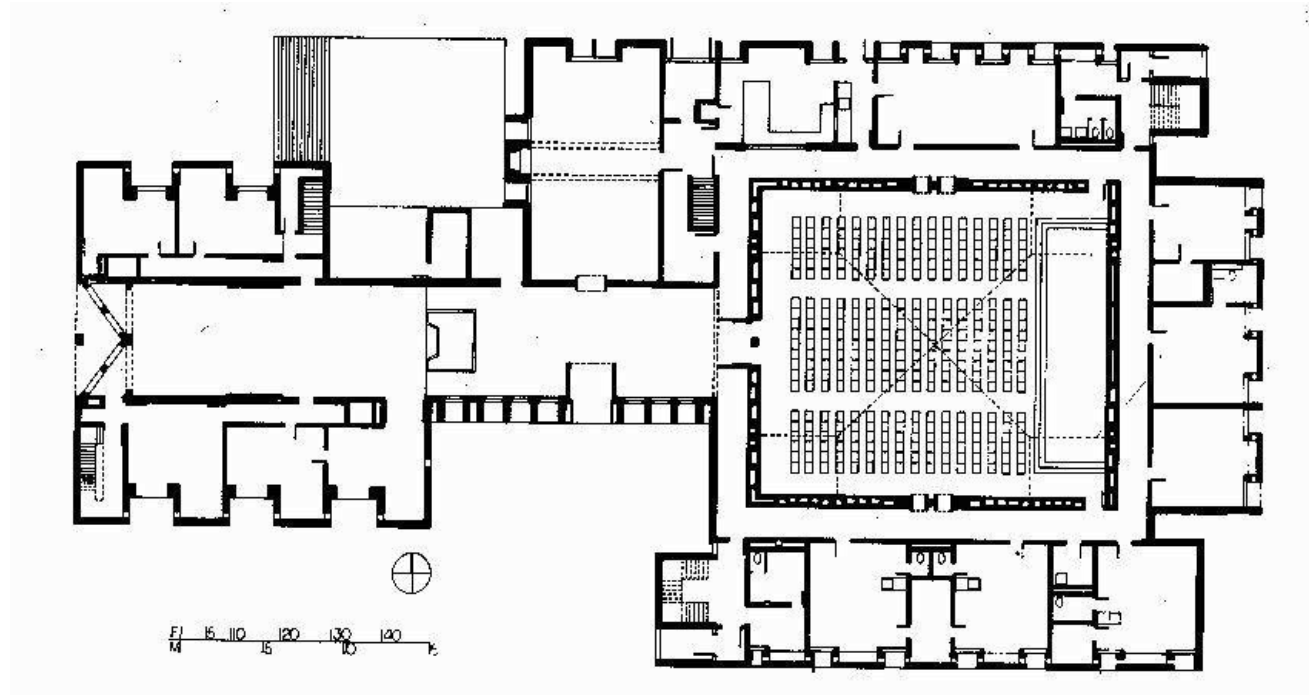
First Floor Plan of The Unitarian Church. Source: Louis I. Kahn Complete Work.
